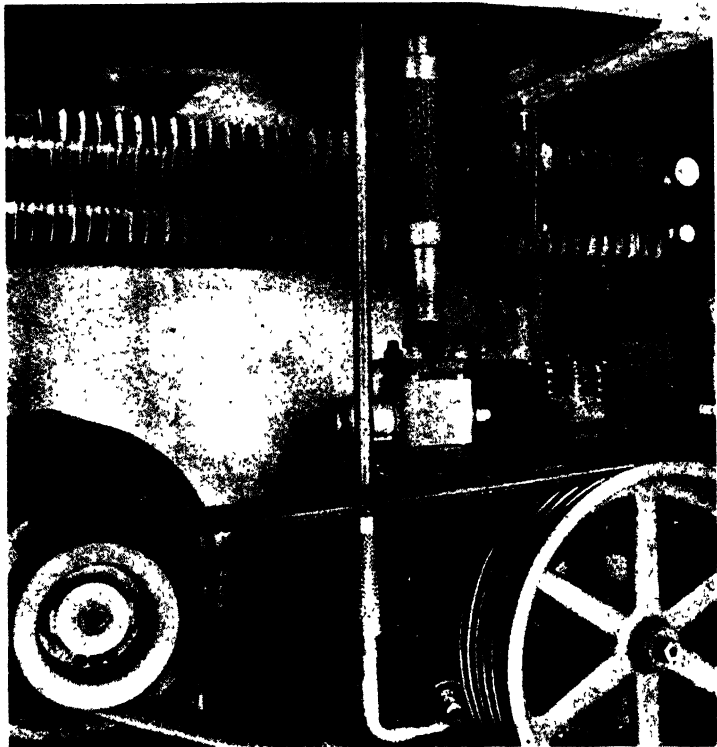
FLEXIBLE METAL CONNEXION USED IN REFRIGERATOR COMPRESSOR PIPING
